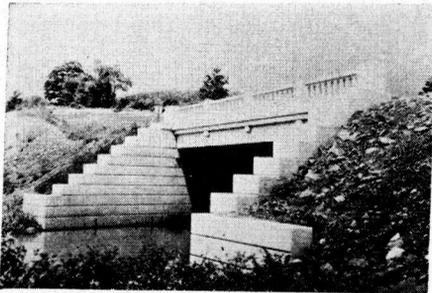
Mass Concrete. Courtesy of Portland Cement Assn.
